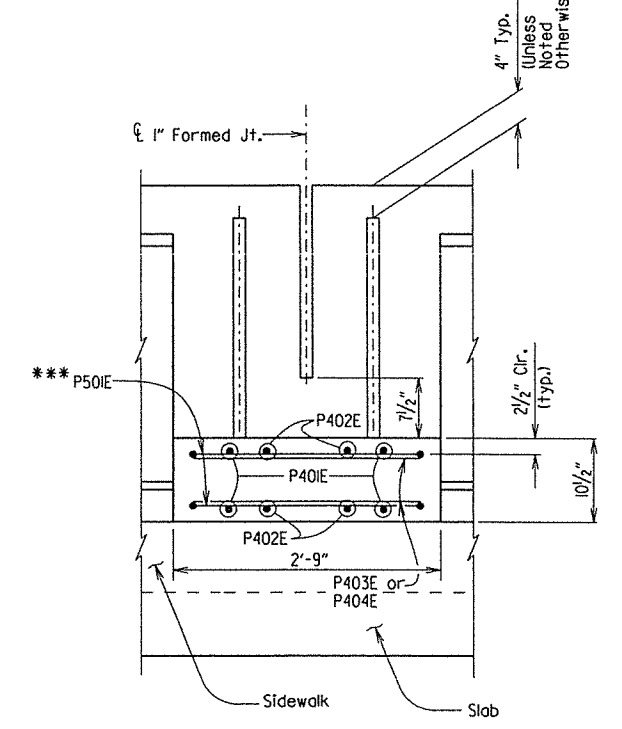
DETAIL B AT PILASTERS WITH PEDESTALS
